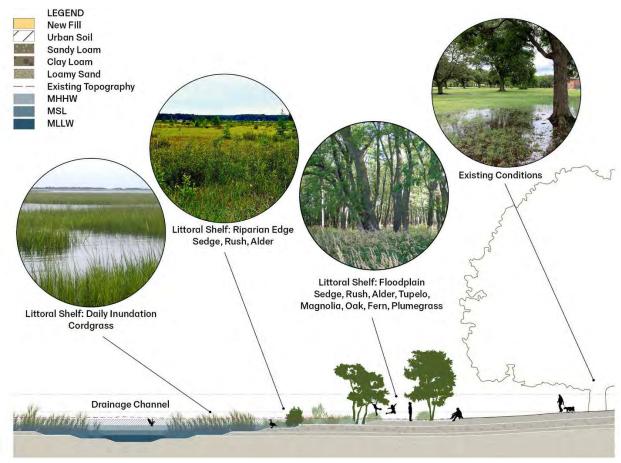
Typical section profile through the daylit Newton's Creek drainage channel
